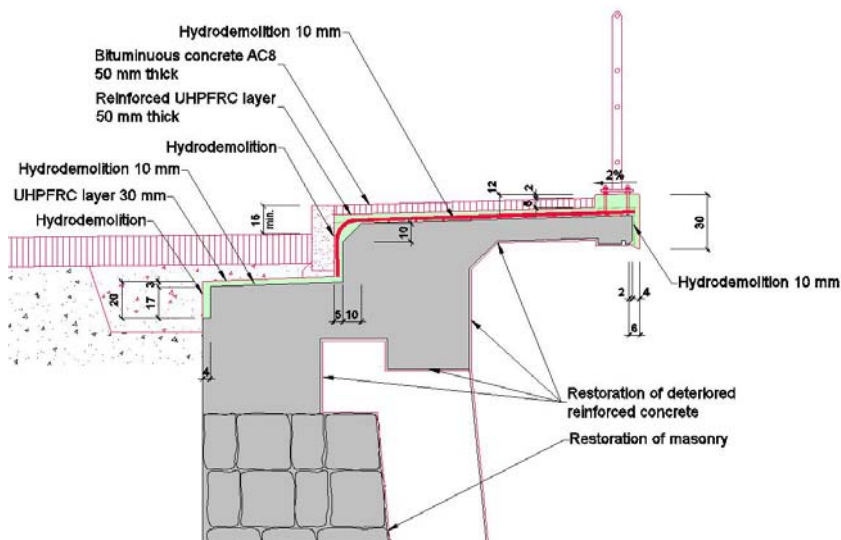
Cross-section of maintained sidewalk slab with the reinforced-UHPFRC layer
